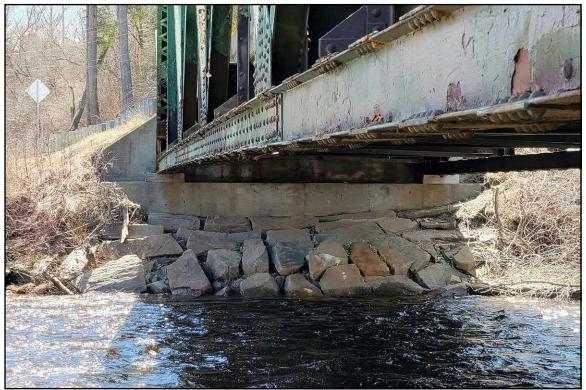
Stone Brought in to Construct Western Abutment, View West
